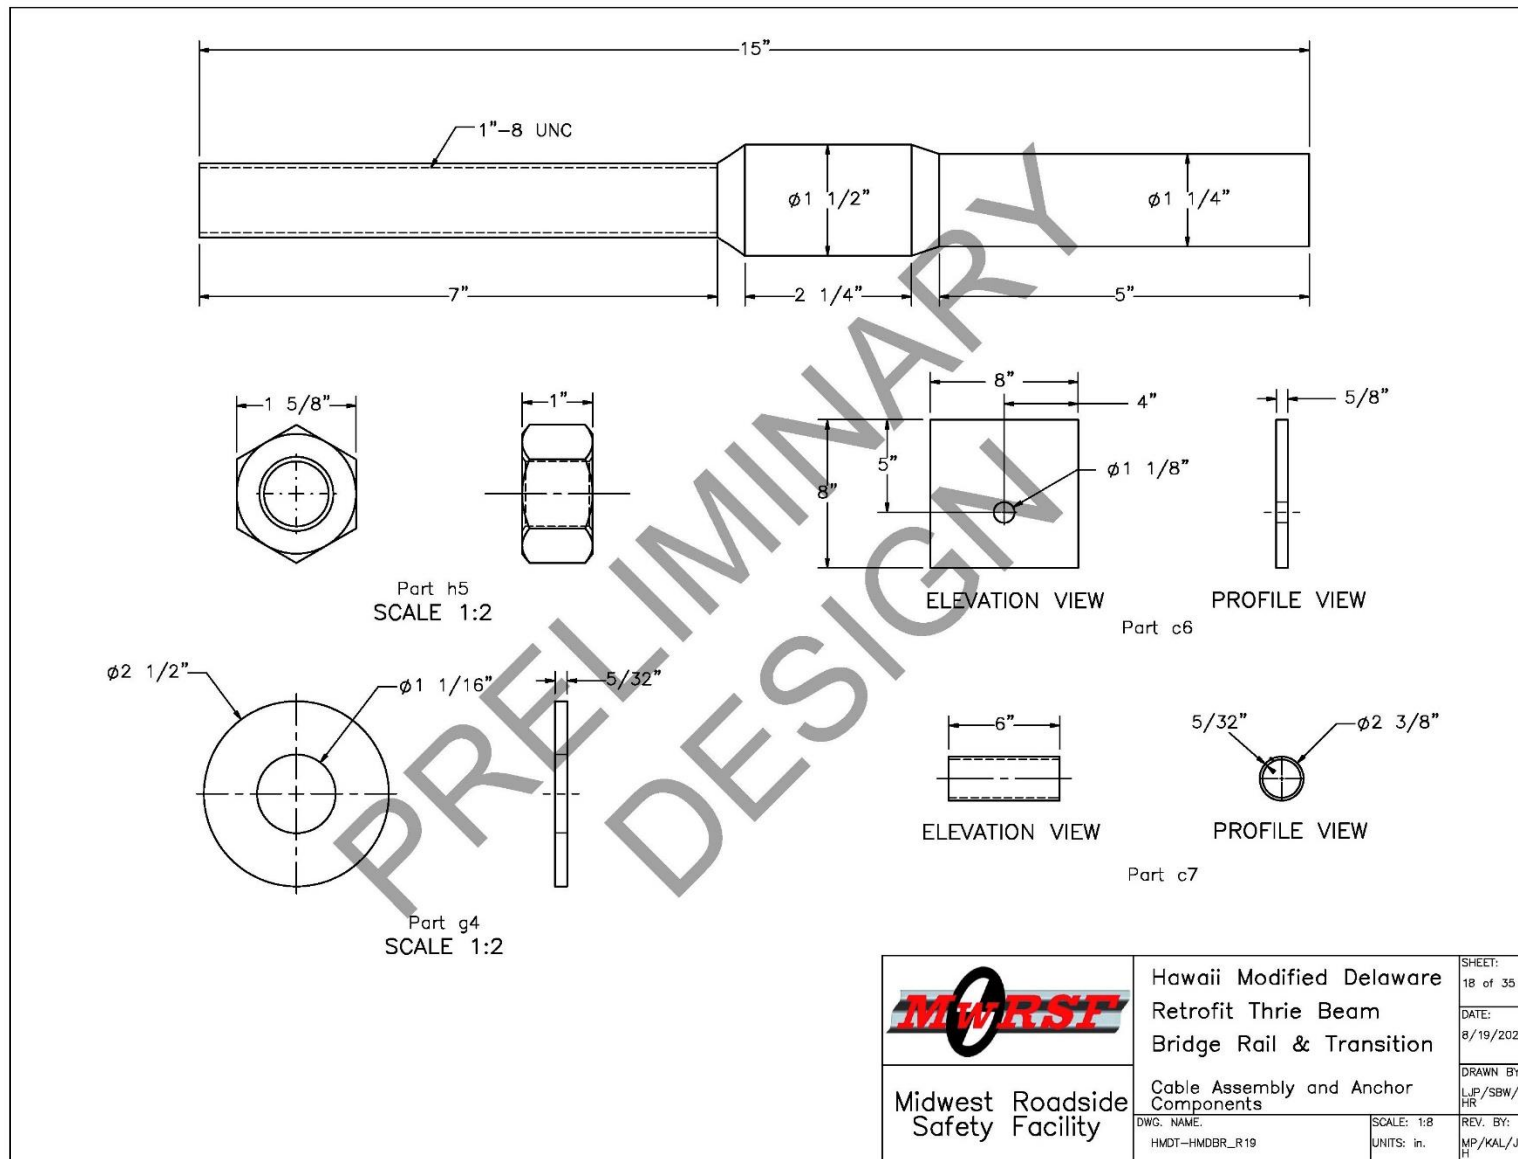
Cable Assembly and Anchor Components, Test No. HMDT-1
